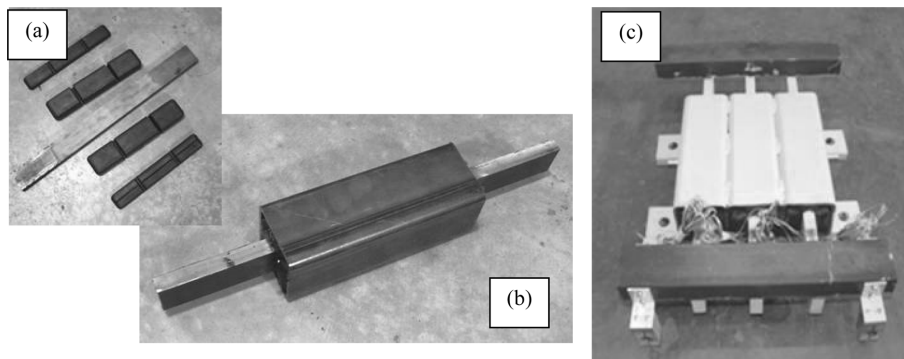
Elastomeric damper: (a) steel bar and elastomer; (b) compressed inside a steel tube, and (c) assembled
